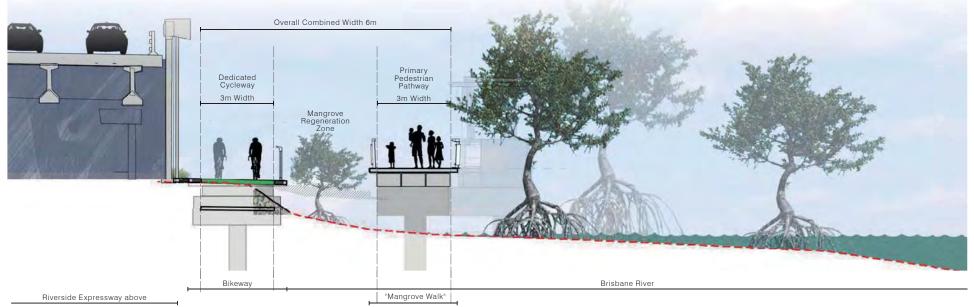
Goodwill Extension Type 1 Sectional Elevation (Not to scale)
